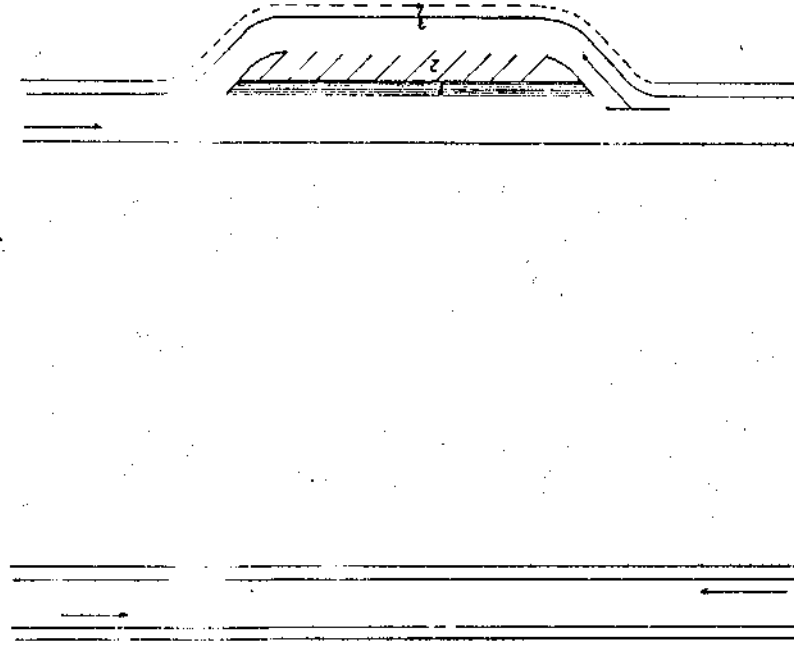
ON-STREET PARKING DESIGN FOR SECTOR 3
